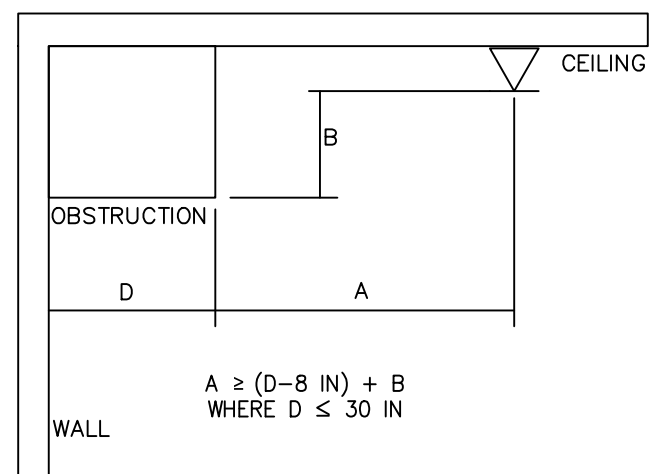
(B) OBSTRUCTIONS AGAINST WALL (RESIDENTIAL UPRIGHT AND PENDENT SPRAY SPRINKLERS)
